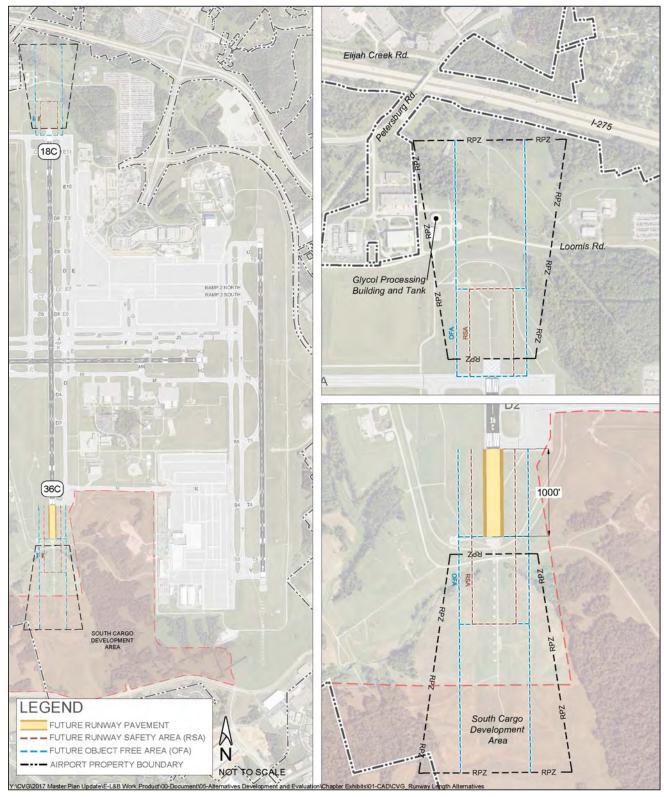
12,000 FOOT RUNWAY 18C/36C – ALTERNATIVE 5
